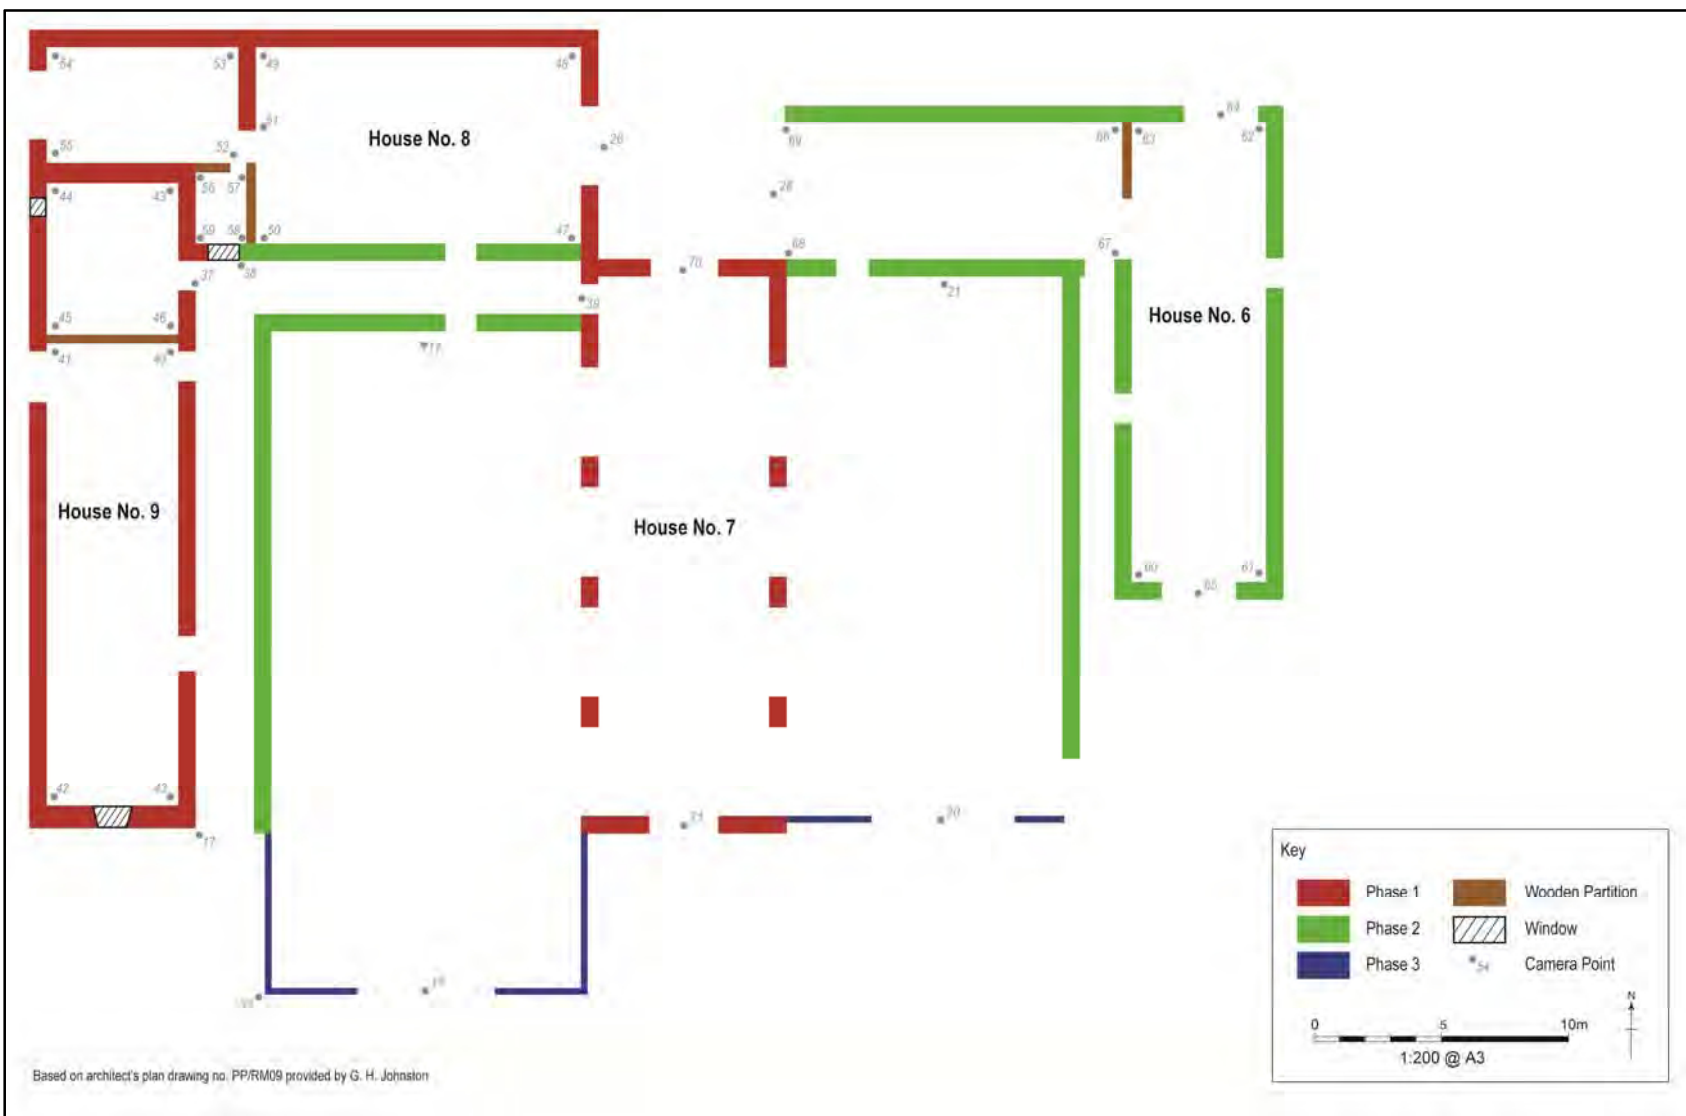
Phase Plan of farm buildings, with Camera Points (L McKinney / K Clarke)
